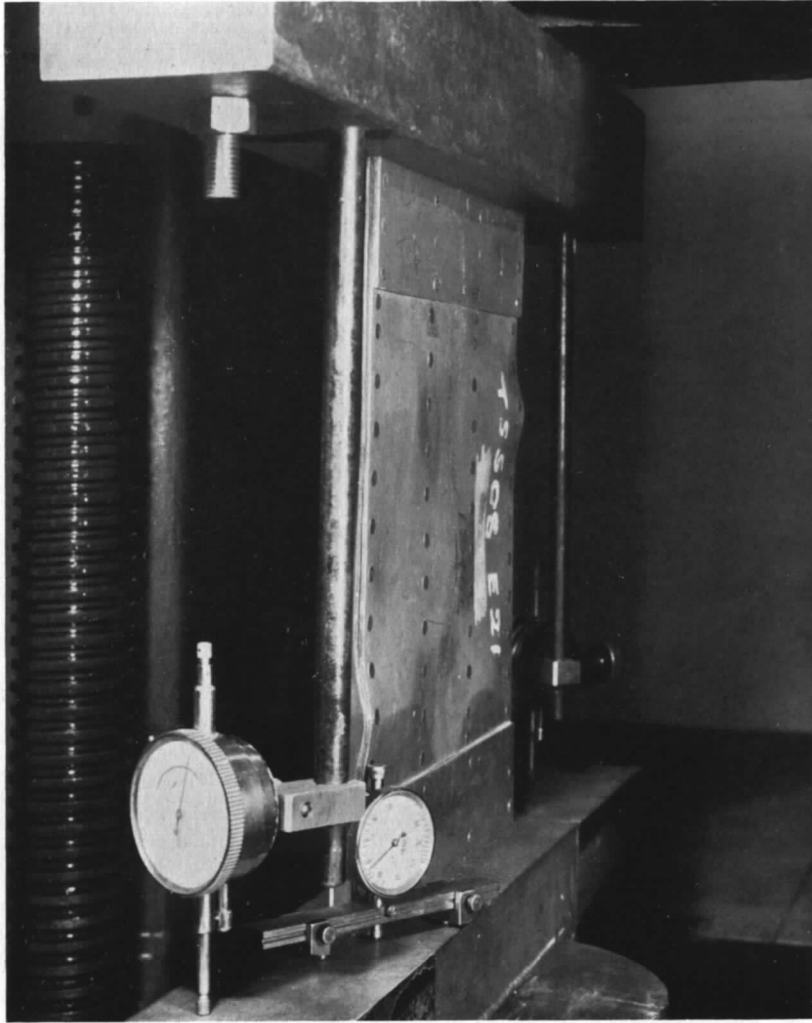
Specimen Number E21 showing typical quilted failure and travelling gauge.
